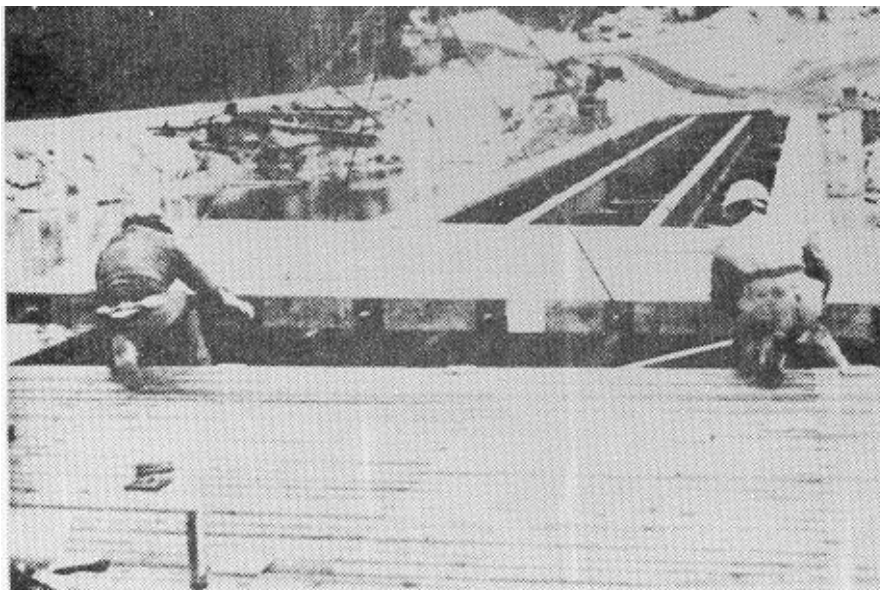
SEGMENTAL DECK CONSTRUCTION ON THE AQUASABON R. BRIDGE.
